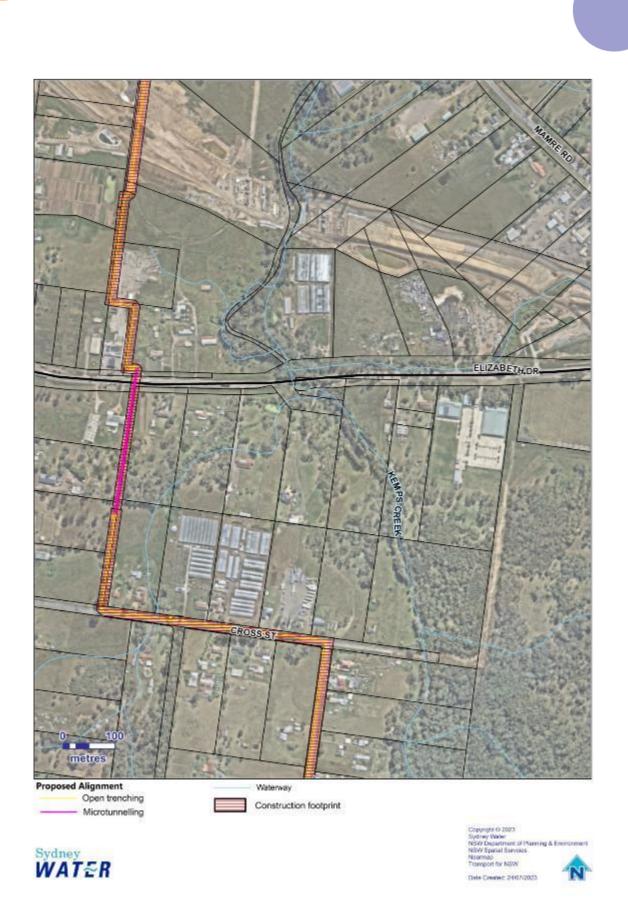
Construction footprint – southern section (Elizabeth Drive)
